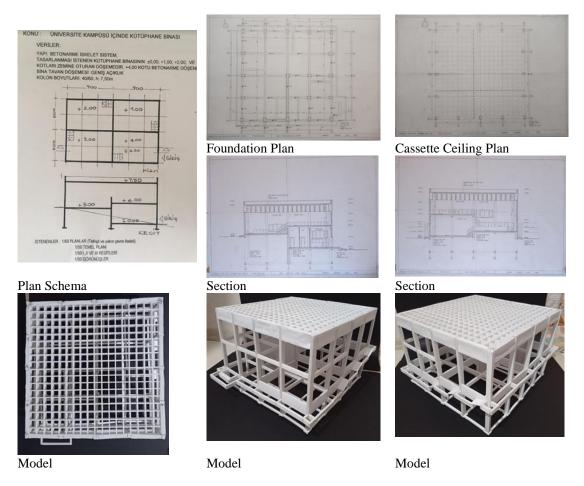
Reinforced Concrete Slab System Practice-10 Schema, Visuals of Student Drawings and Model
